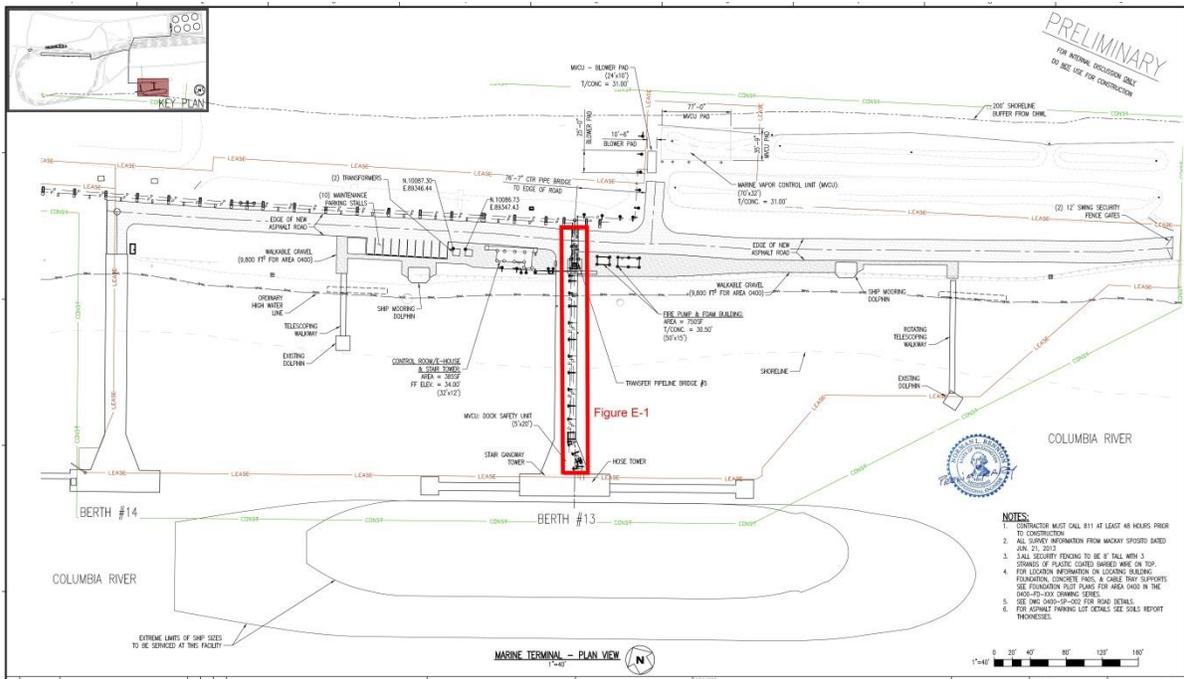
Figure B-1 on Marine Terminal Enlarged View Plan (Ref. (2))
